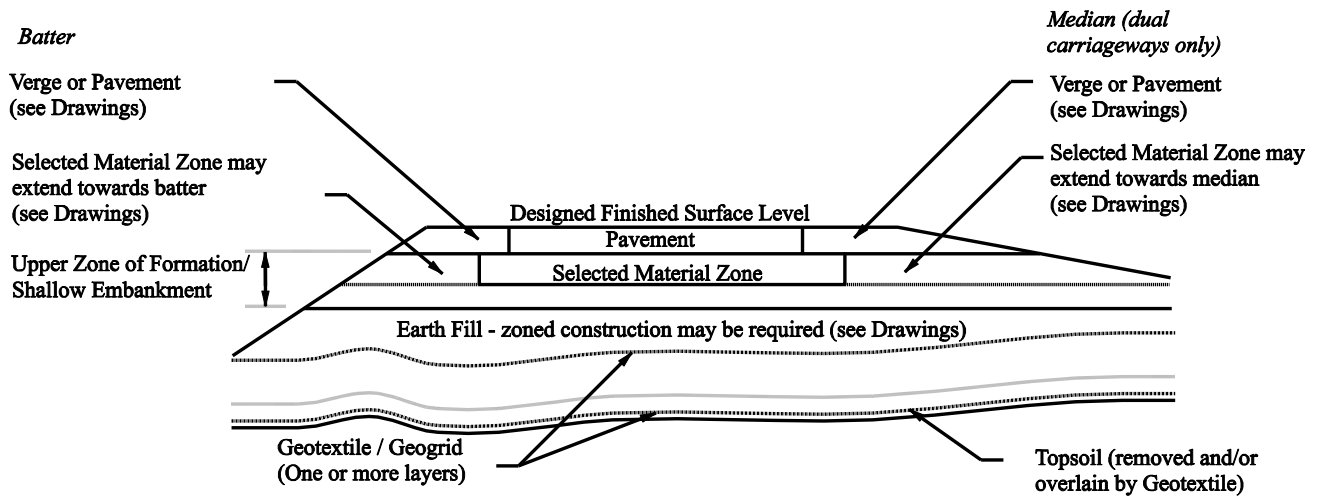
(d) – Embankment Foundation Treatment – Type E4
